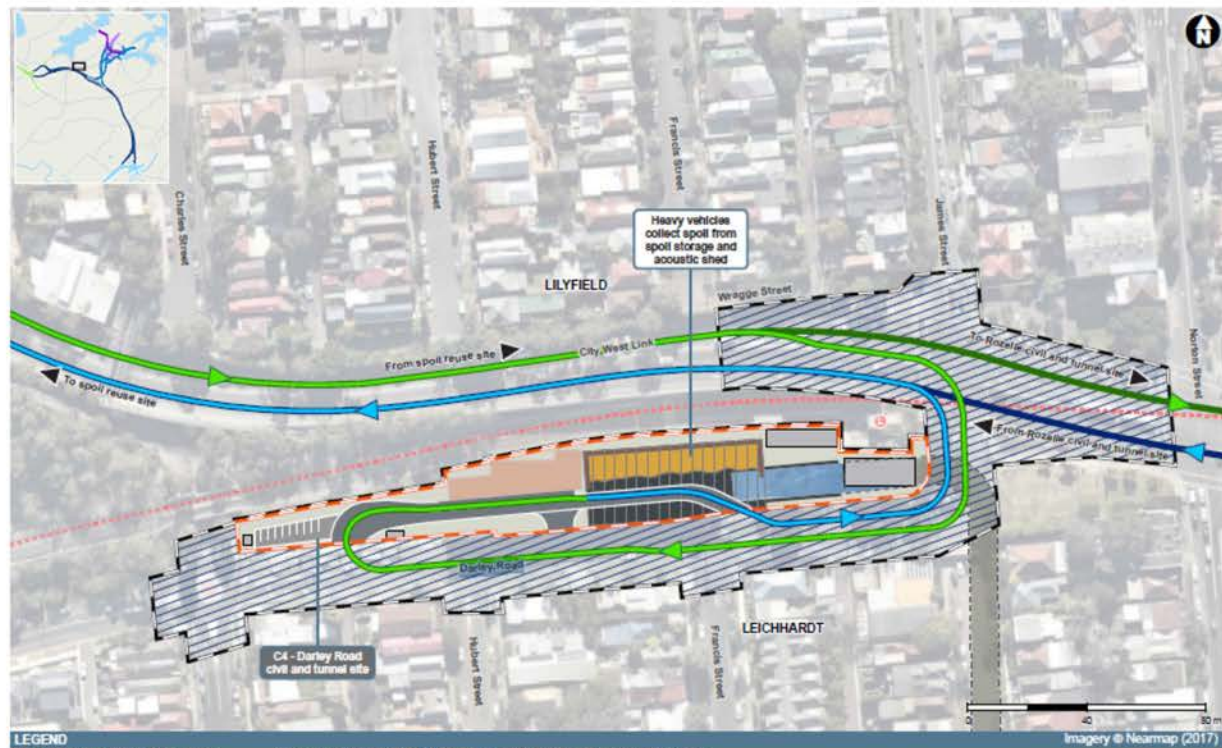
Indicative spoil haulage route – Darley Road civil and tunnel site (C4)
